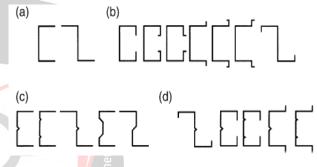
Channel and Z cold-formed sections (a) Plain sections; (b) Sections with flange stiffeners; (c) Sections with web stiffeners; (d) Sections with flange and web stiffeners
